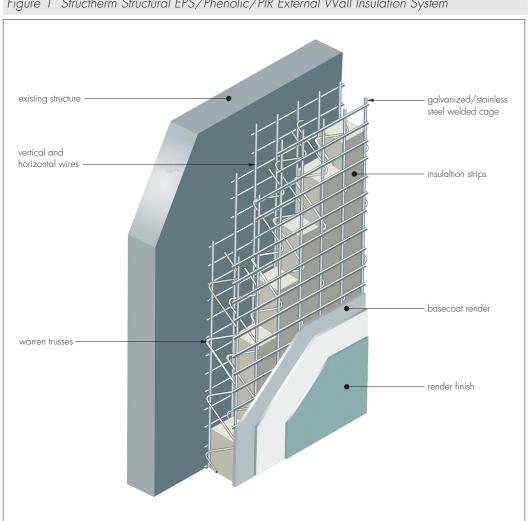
Structherm Structural EPS/Phenolic/PIR External Wall Insulation System
